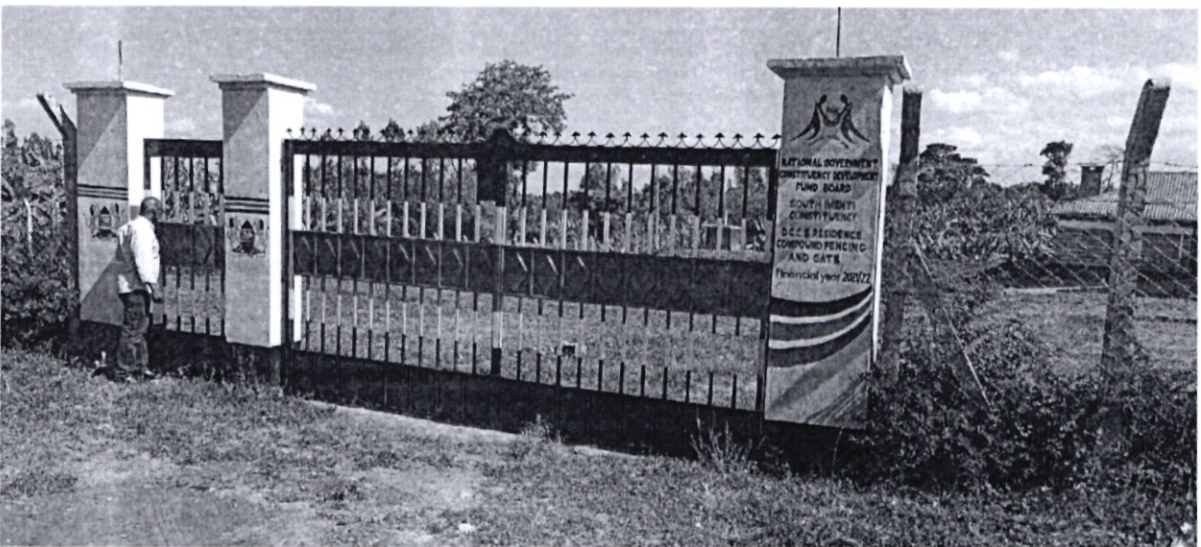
(b): Construction of South Imenti DCC Residence and Fence works at Kaguru Trading Centre
